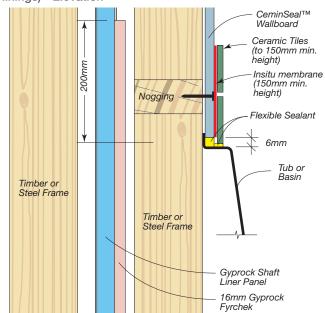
Laundry Tub/Basin Installation (continuous linings) - Elevation
